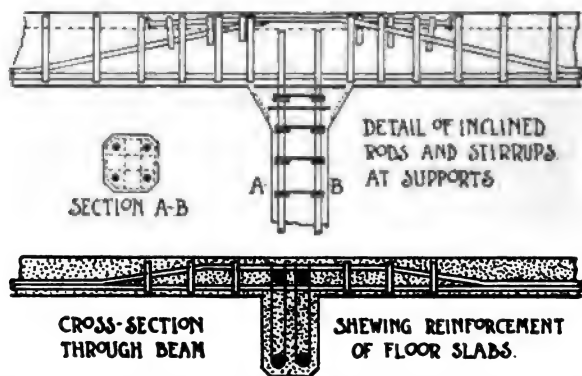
Hennibique's Later Reinforced Beams and Stanchions.
